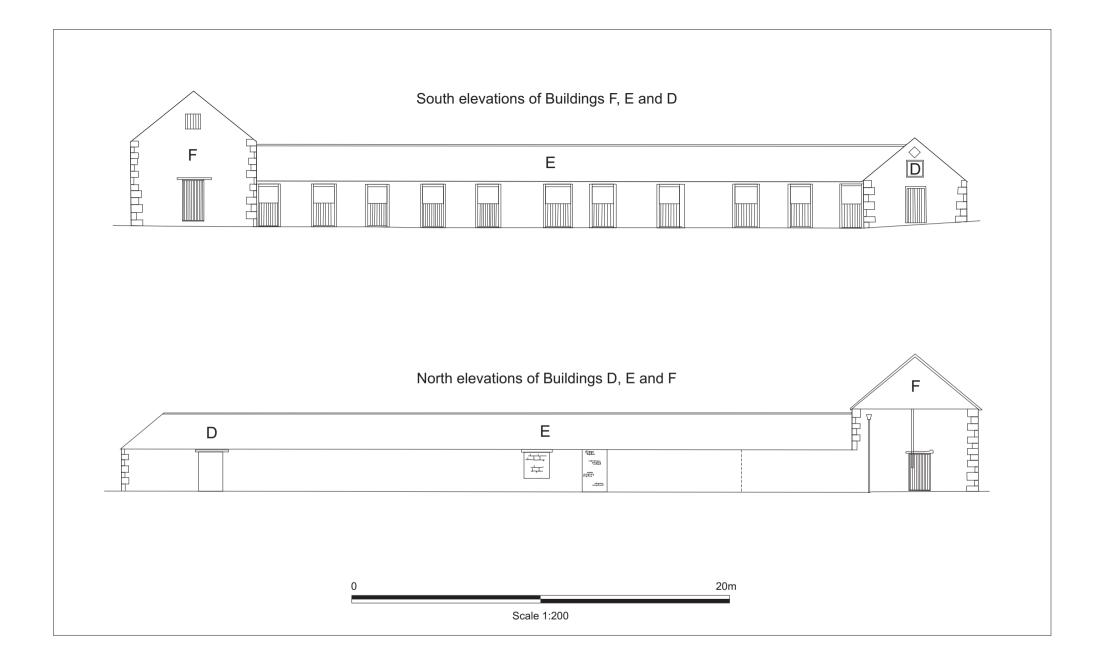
South and north elevations of Buildings D, E and F at scale 1:200
